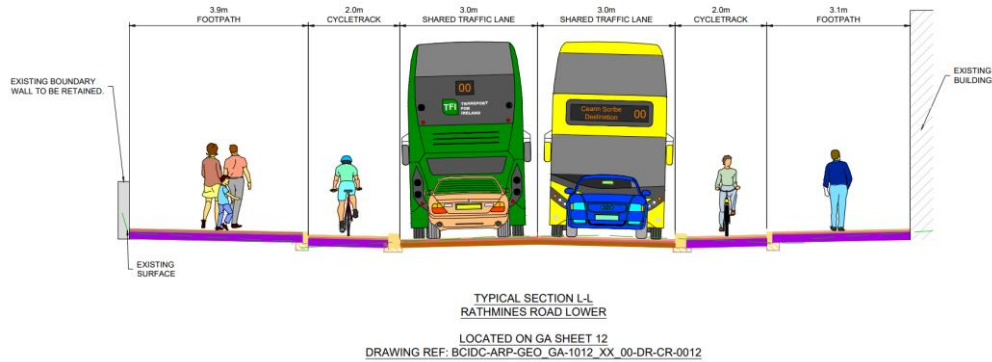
Typical Section L-L on Rathmines Road Lower
